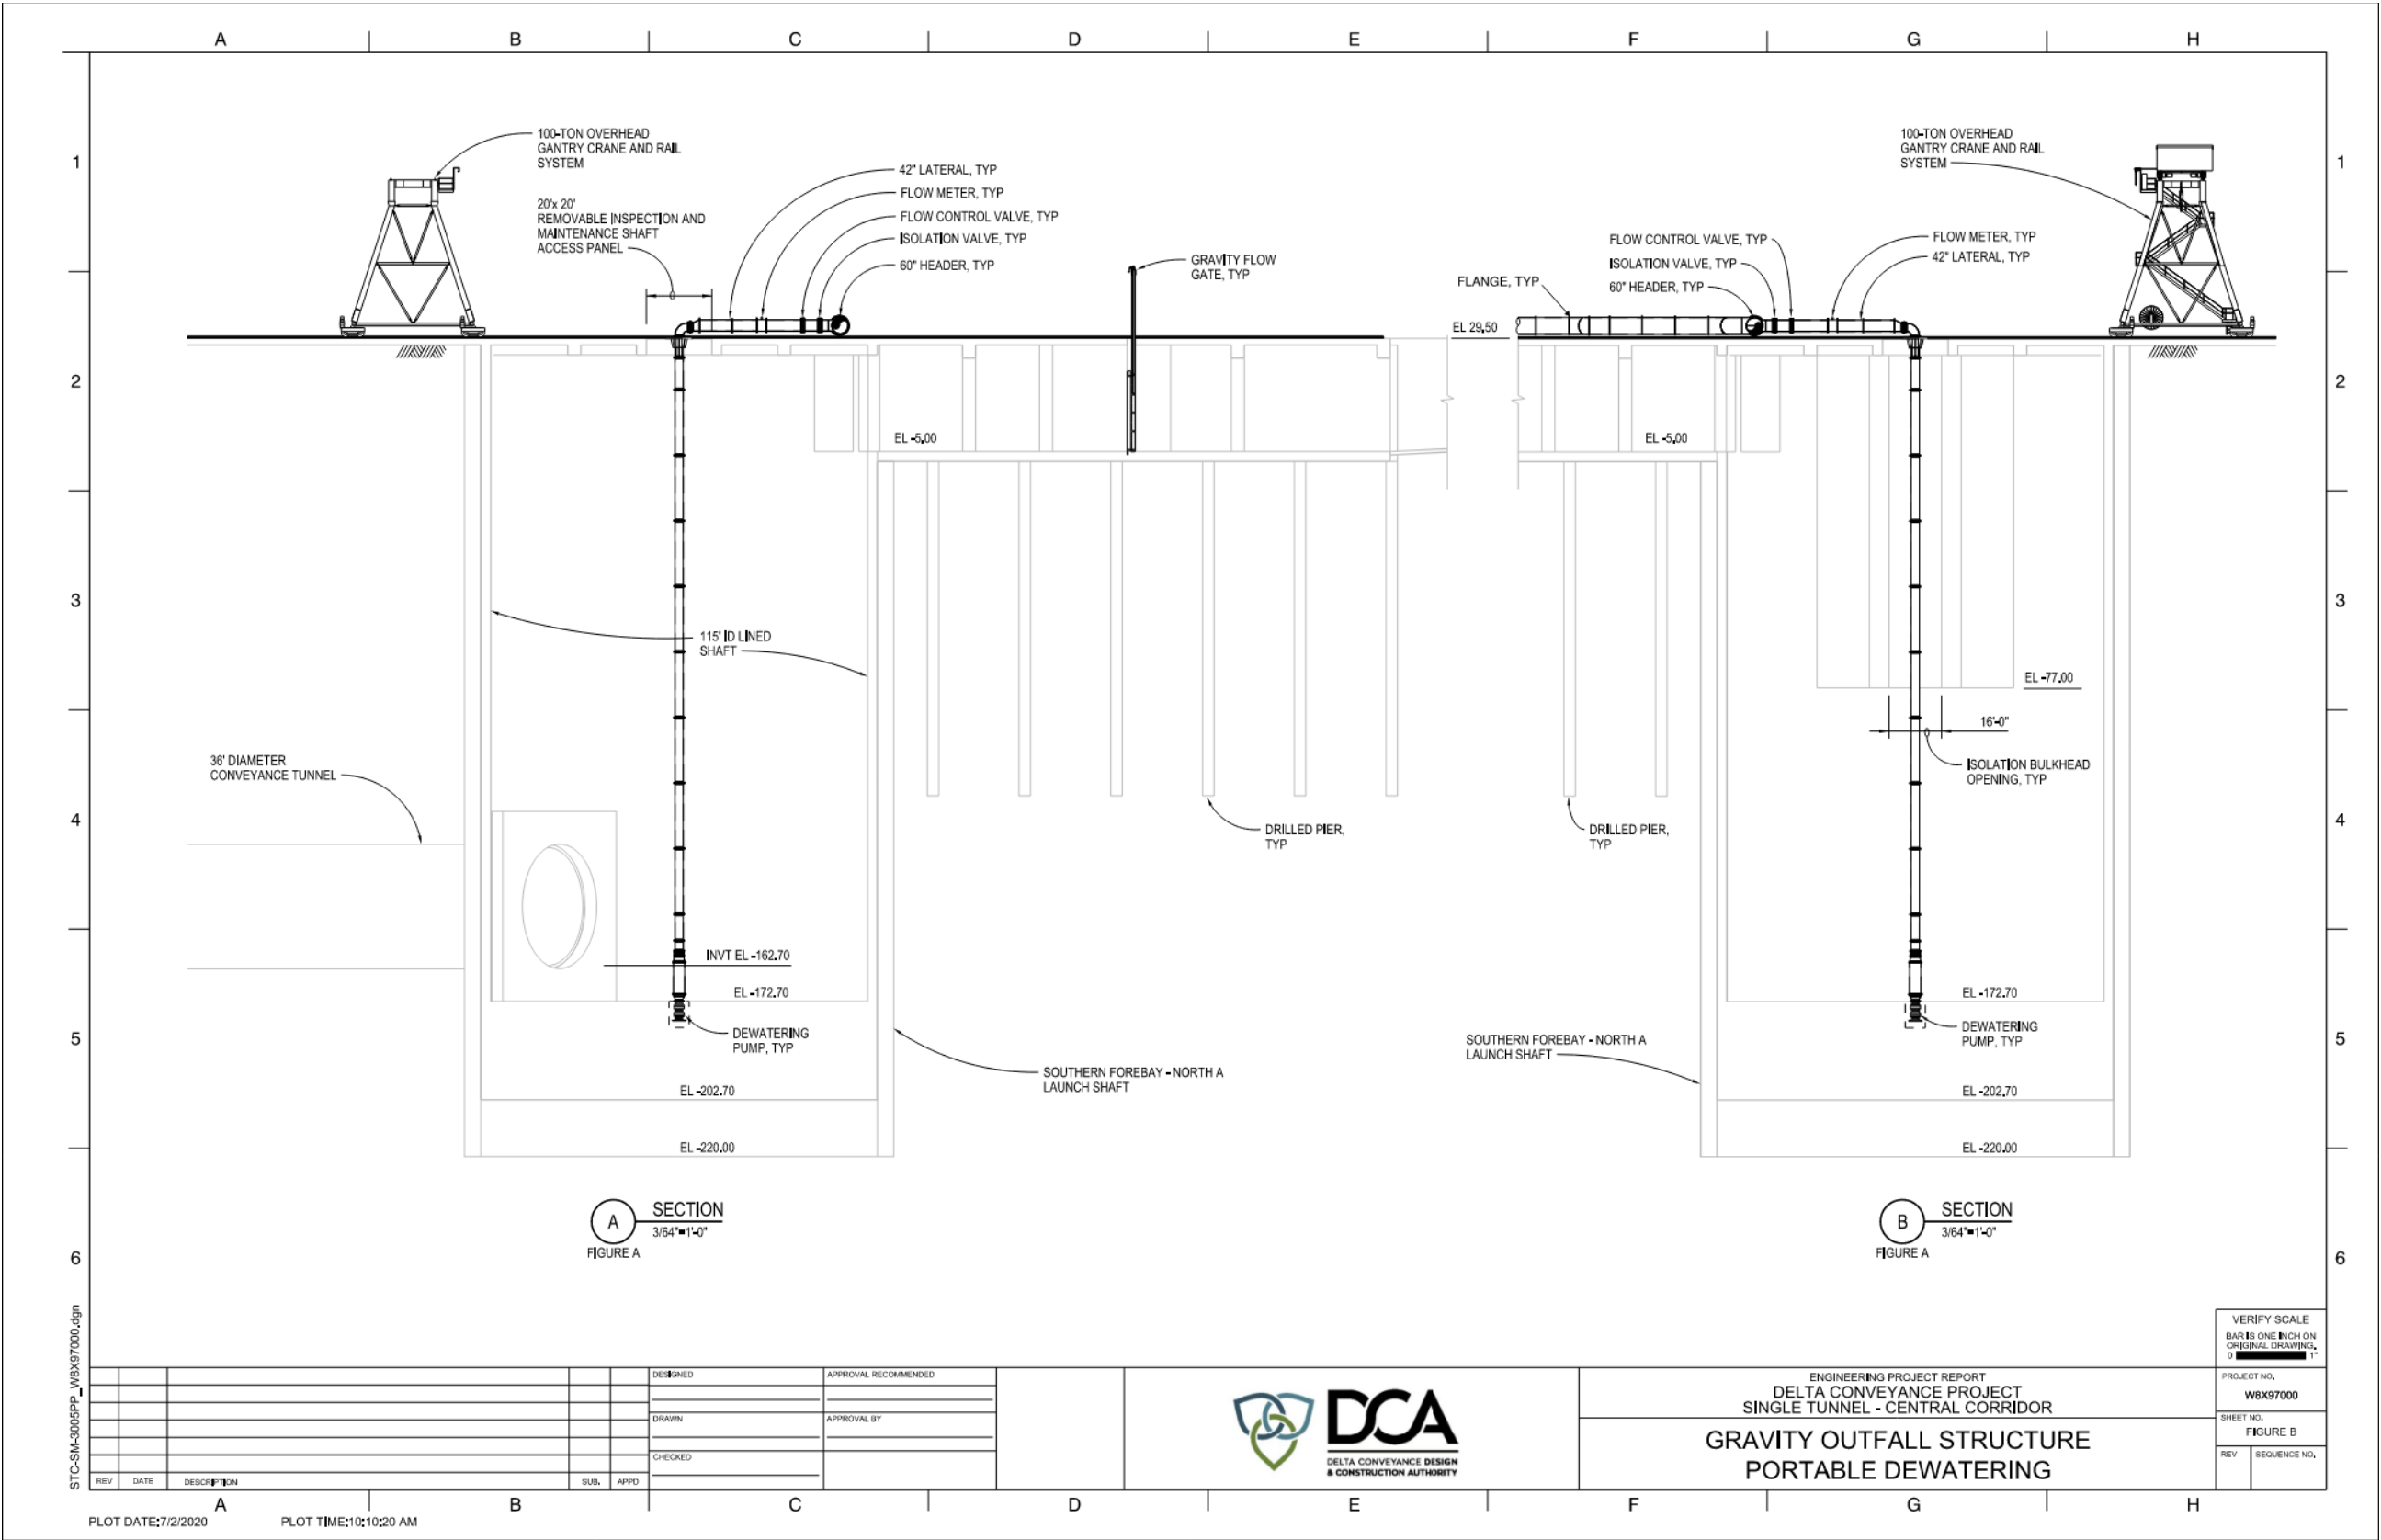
Portable Dewatering Pumping Plant Layout (Section)
